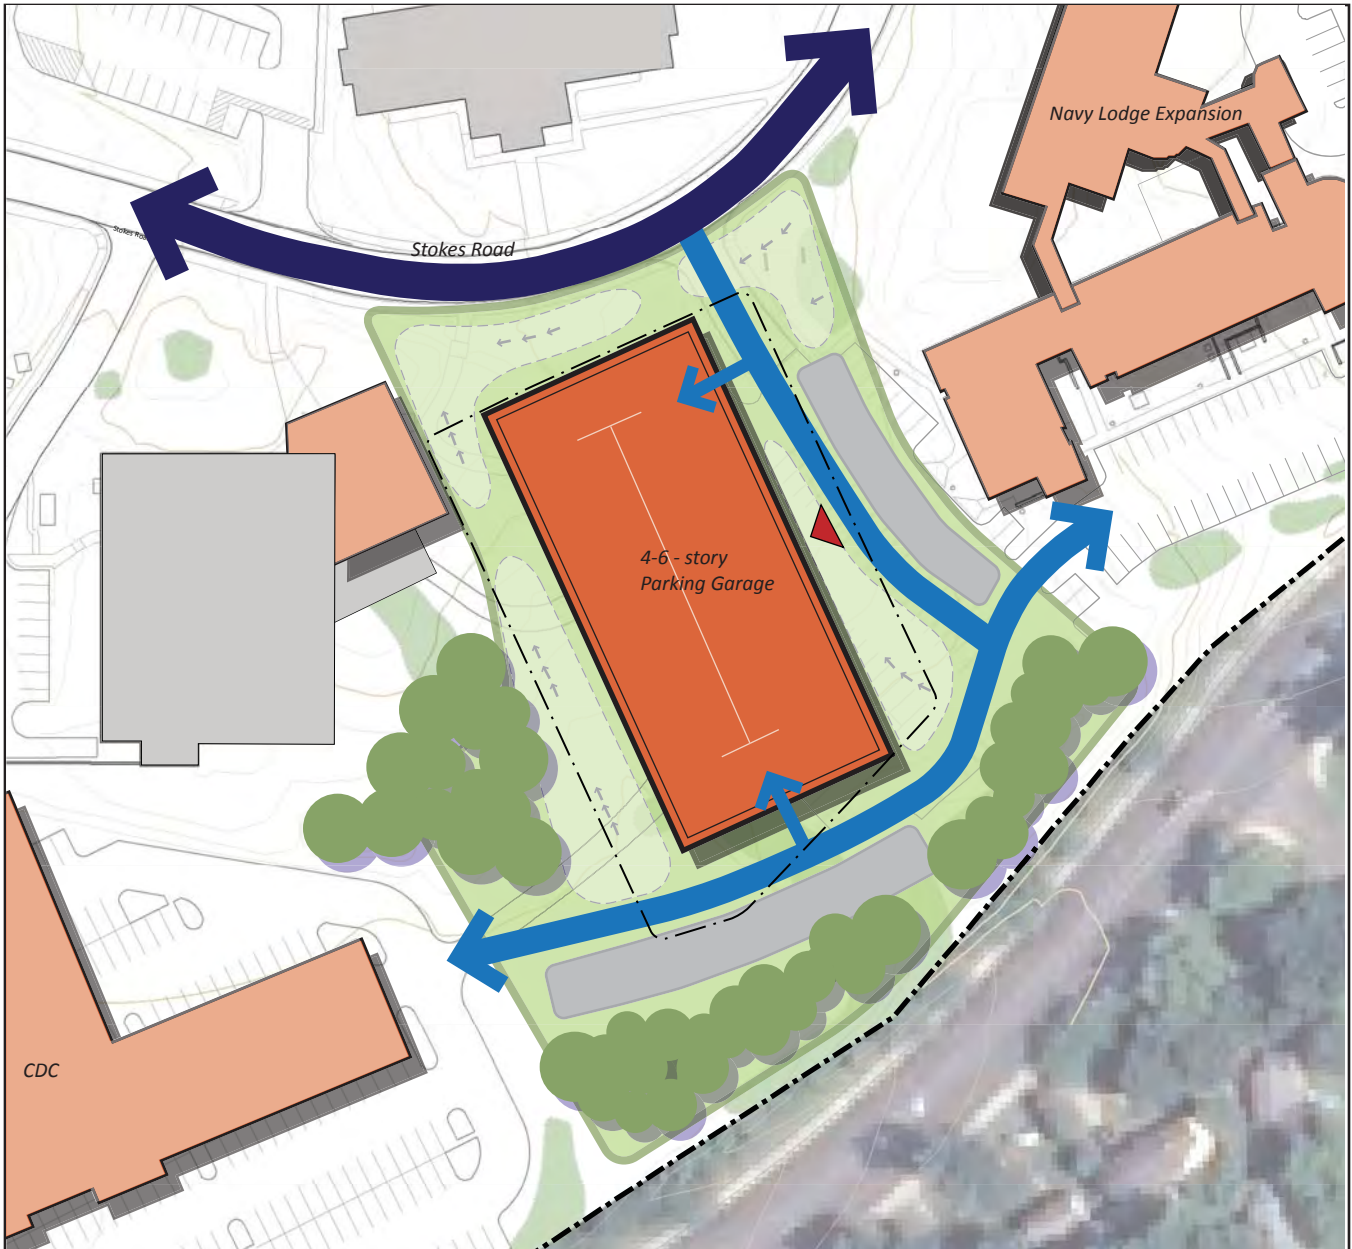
H LOT PARKING GARAGE CONCEPT DIAGRAM
